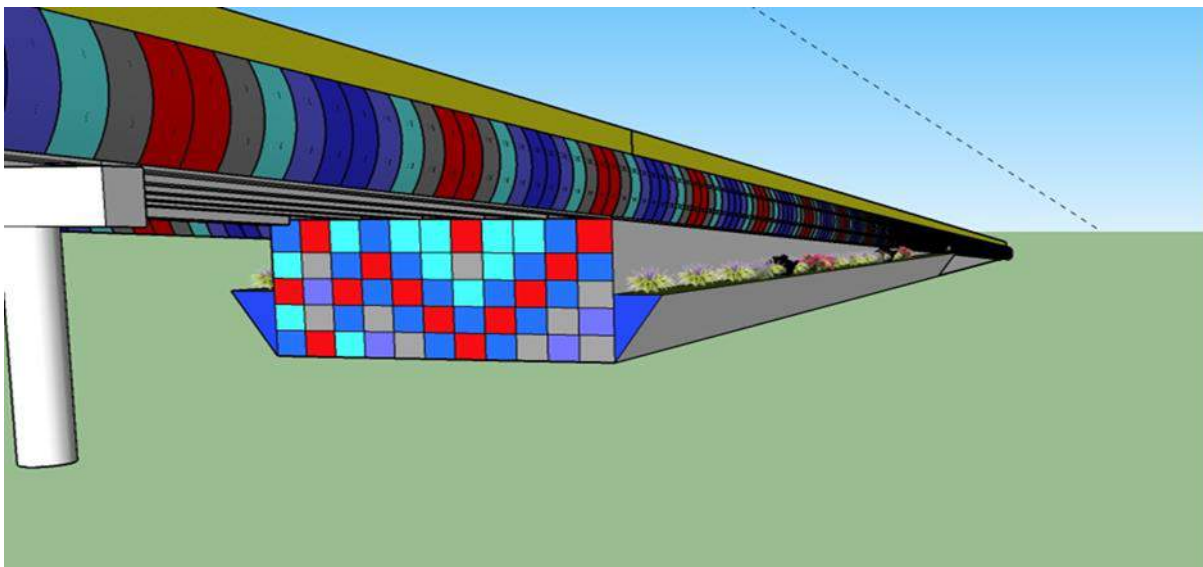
Retaining wall concept design #1 (DPC Urban Planning 2017)
